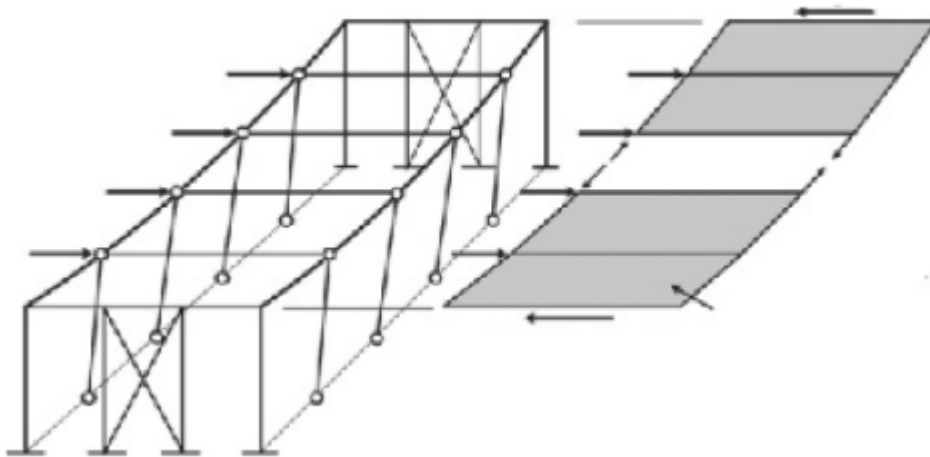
Diaphragm action in the roof. The roof is modelled as a beam where the gables act as supports (Source: [6], edited).
